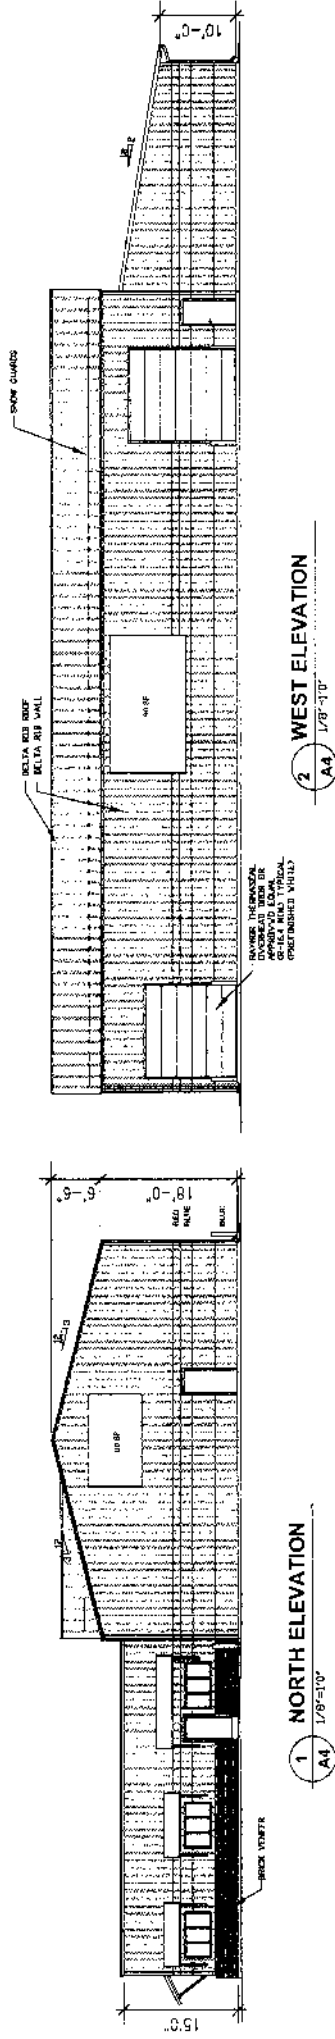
EXHIBIT F - STORAGE/WAREHOUSE BUILDING
